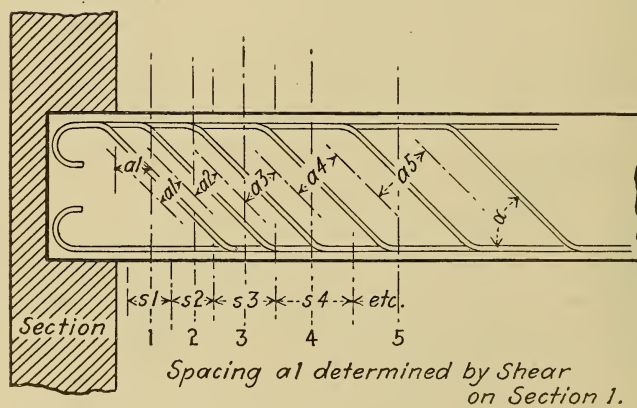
Typical Beam with Web Reinforced by Means of Series of Inclined Bars.
